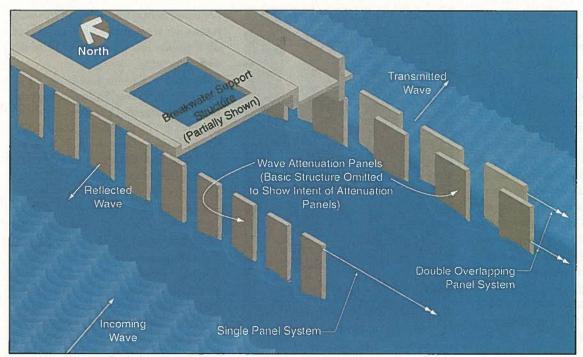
Schematic plan of proposed permeable breakwater system, shown with a partial deck system.
